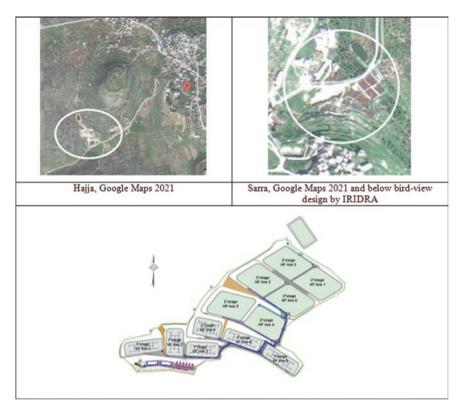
Areal views of Hajja and Sarra CW WWTP as well as Sarra CW WWTP plan layout in Palestine
